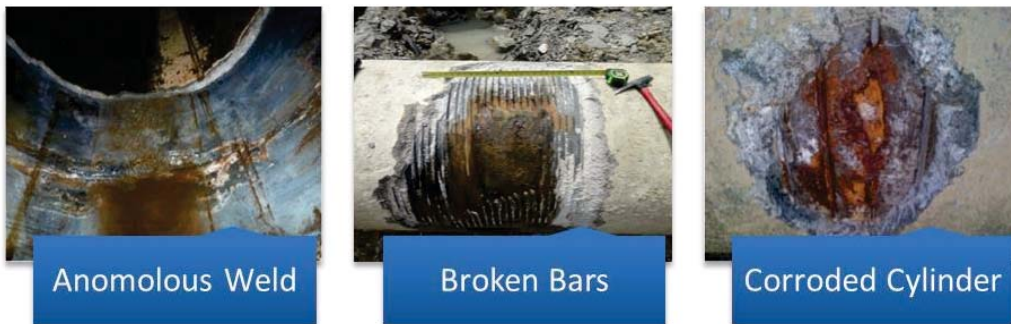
Examples of distressed bar wrapped pipe identified by EM inspection
